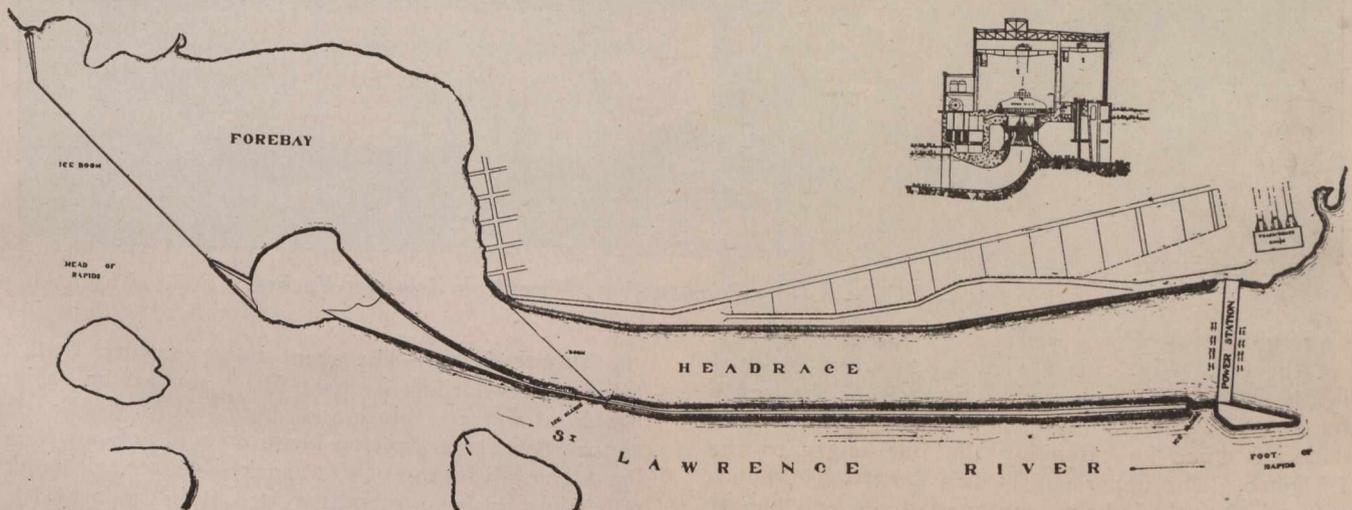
General Arrangement of Plant, and Cross Section of Power House.
